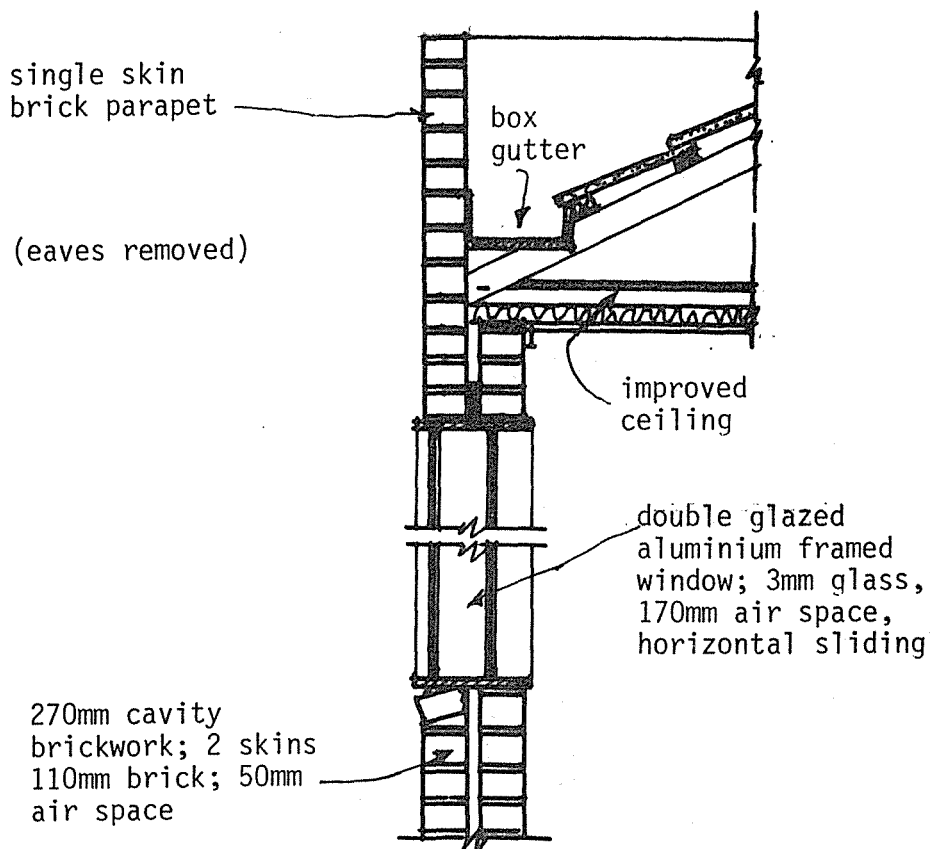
DOUBLE GLAZED WINDOW IN BRICK FACADE WITH PARAPET
